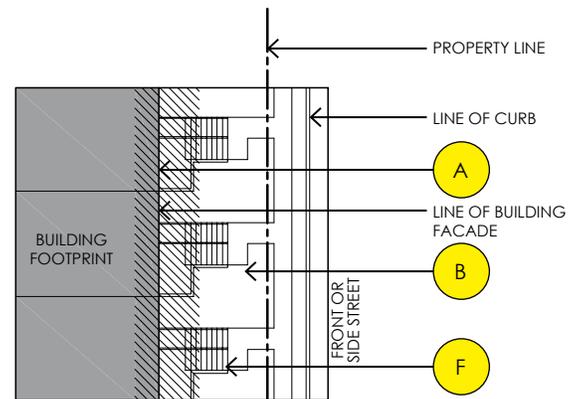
ROWHOUSE BUILDING WITH LIGHTWELL FRONTAGE
